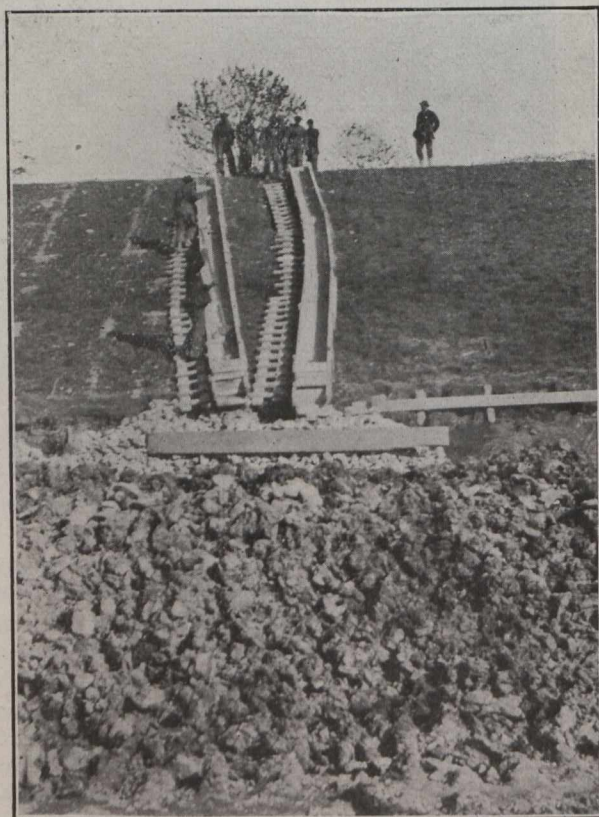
Chutes for Depositing Crushed Stone Foundation Layer.
